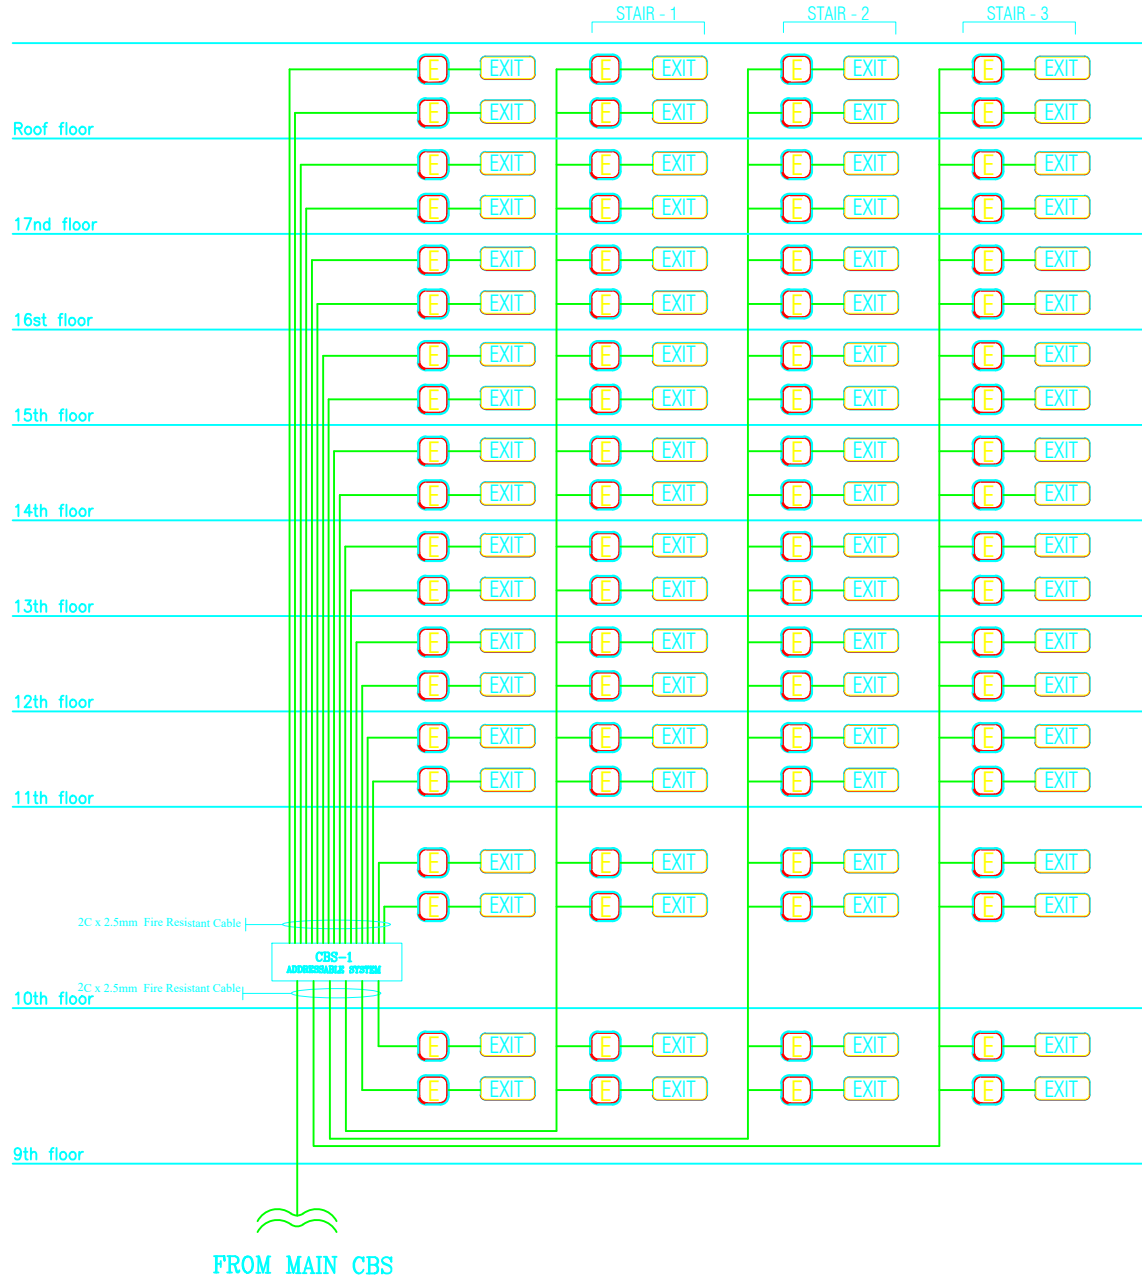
Central Battery System Riser Diagram for 9th to roof floors .
